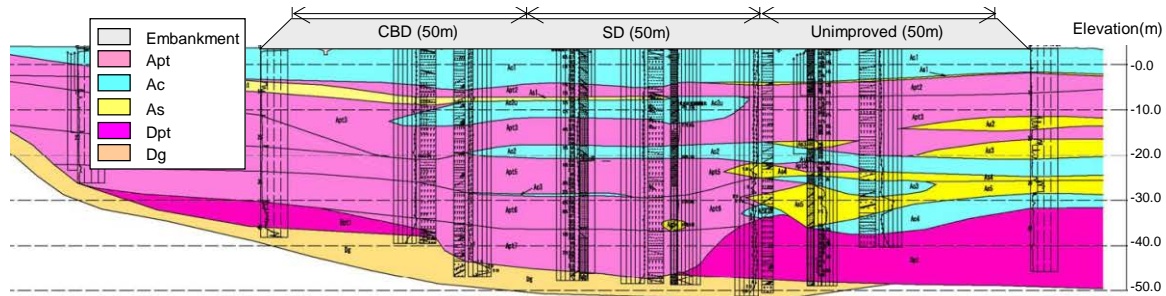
Schematic of test embankment and underlying soil strata (longitudinal cross section).
